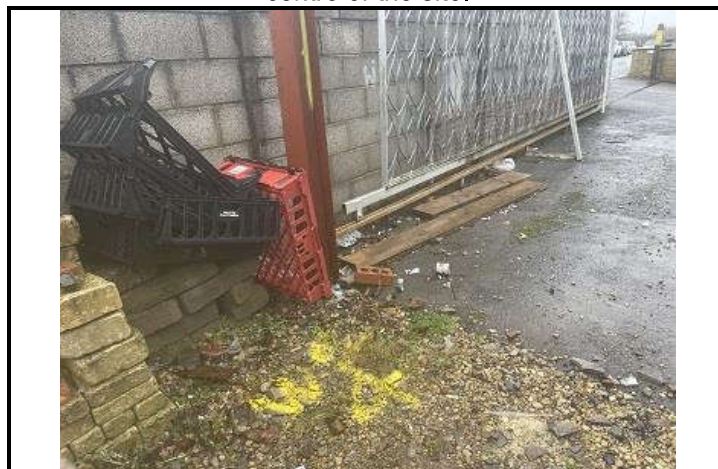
/1057/R3/P 21 – Location and commencing surface at Window Sample WS4 – at the northwest area of the site.
